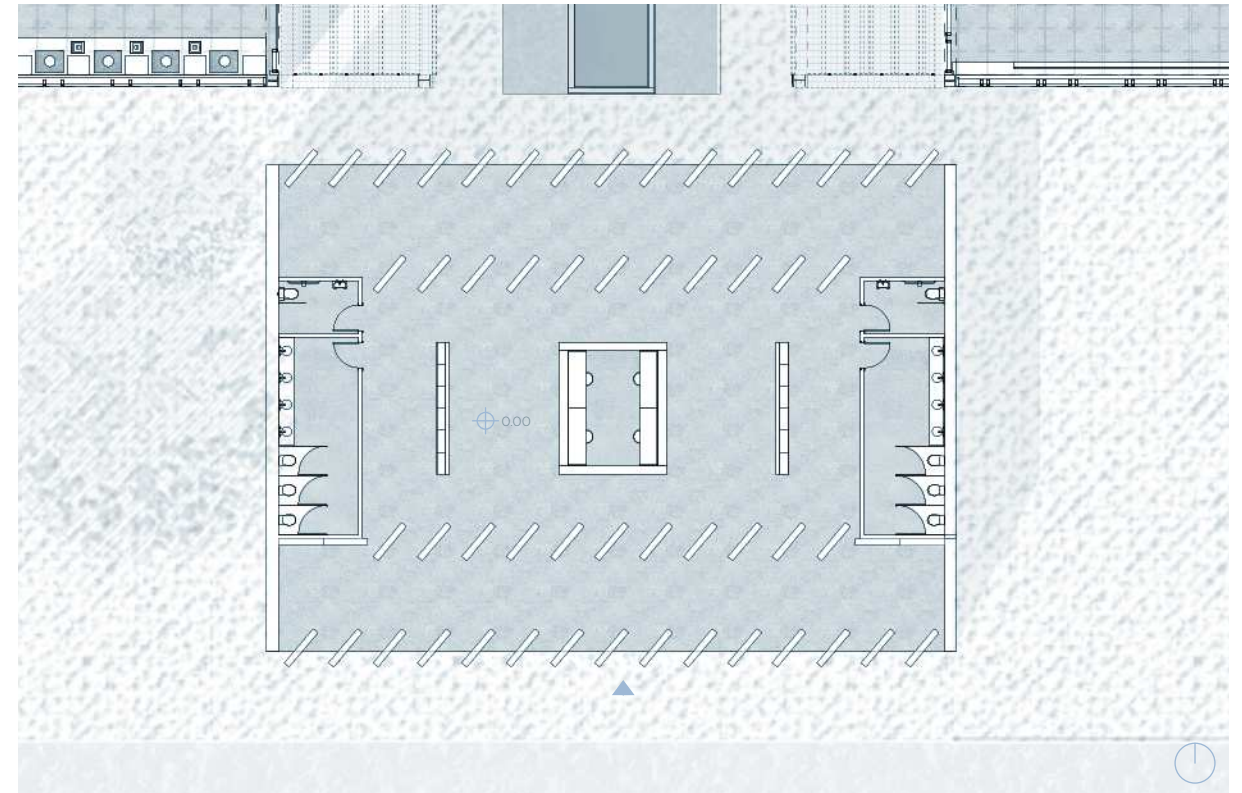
Ground Floor Plan of Ticket Office, authors scale 1:250
